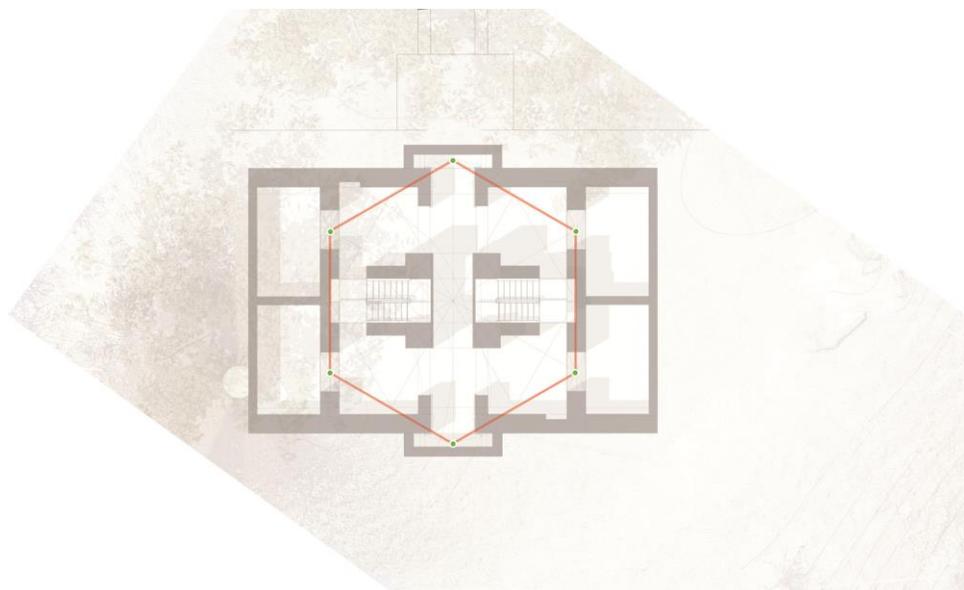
Blackwell Tower: Subgrade Level Floor Plan Diagram
